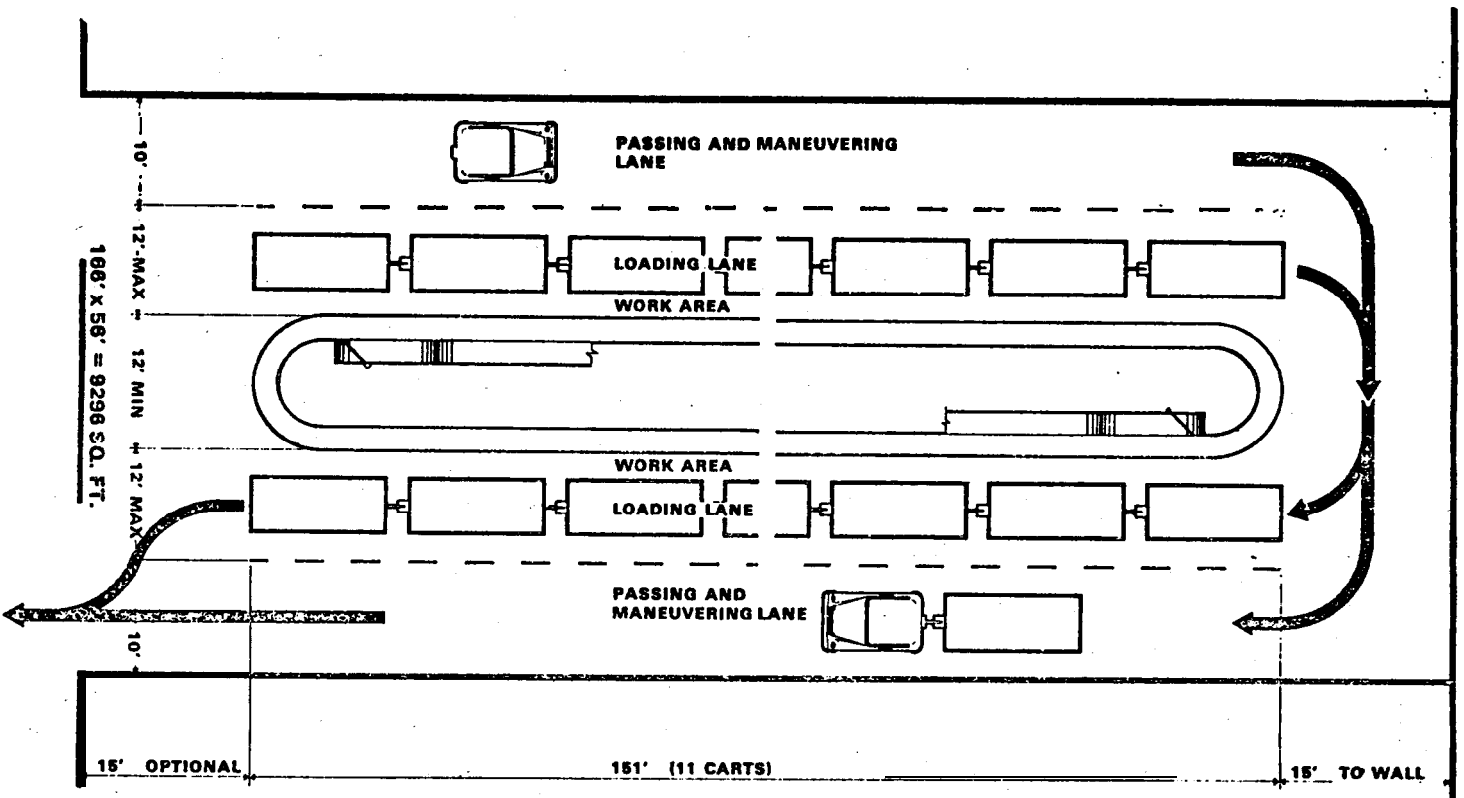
Outbound Bagga Recirculating Belt - Parallel Parking
